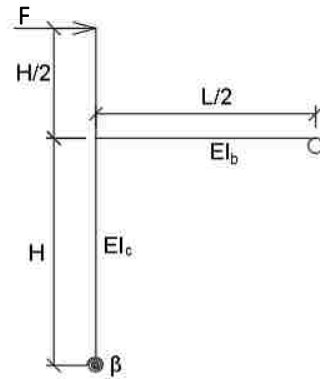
Exterior element of a multi-story and bay moment frame with system parameters labeled and partial fixity noted at the top of the slab.
